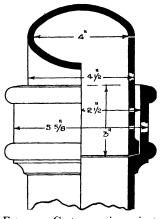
Cast-iron pipe spigot and socket (British Standard Specification).
